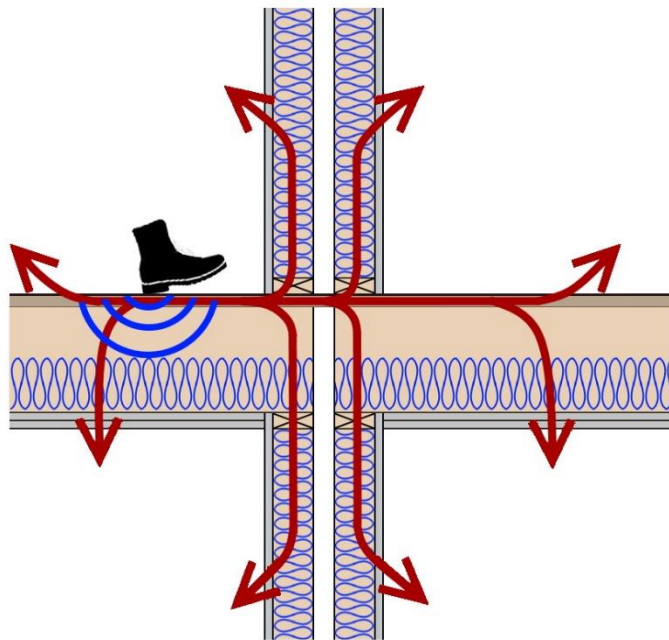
Footfall impact-induced structure-borne sound pathways for a multi-story timber wall and floor junction. with a cavity wall and continuous top floor layer
